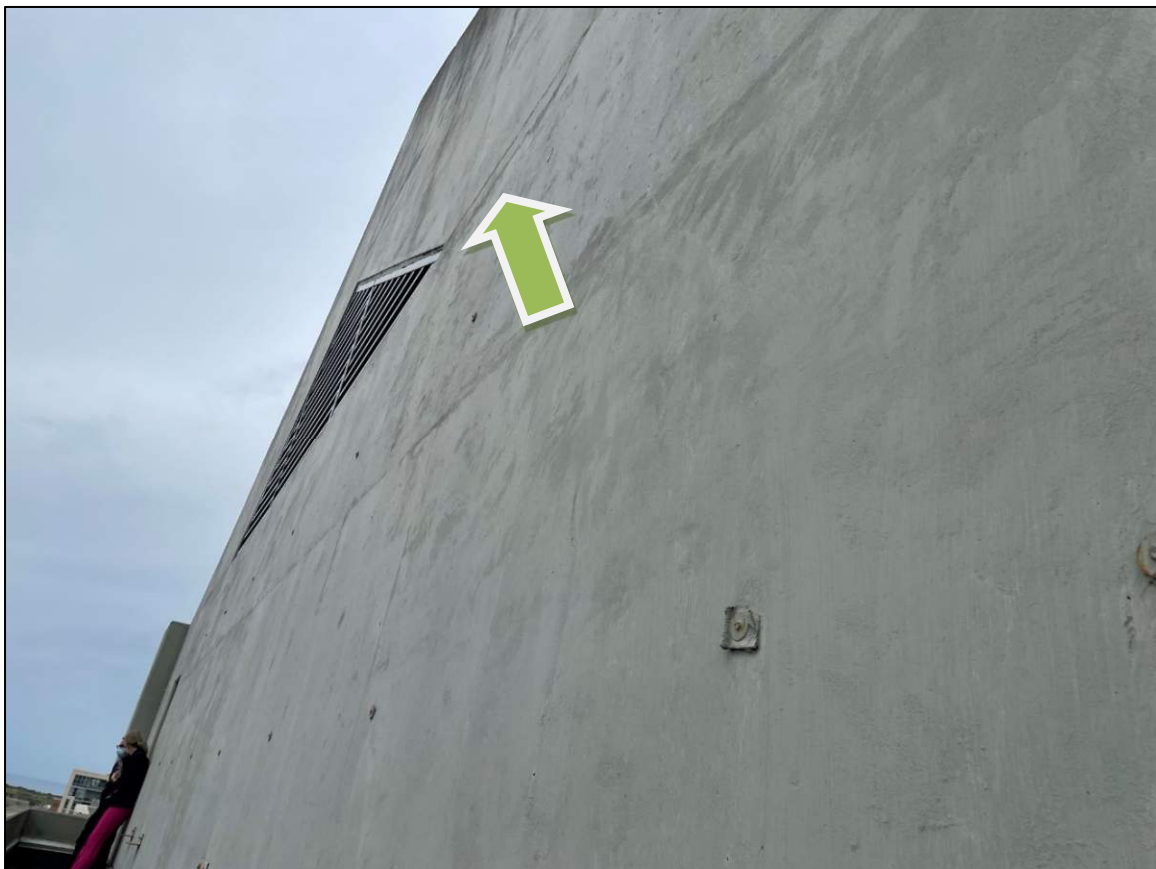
A horizontal crack follows a cold joint in the exterior wall and is aligned with a louver.
